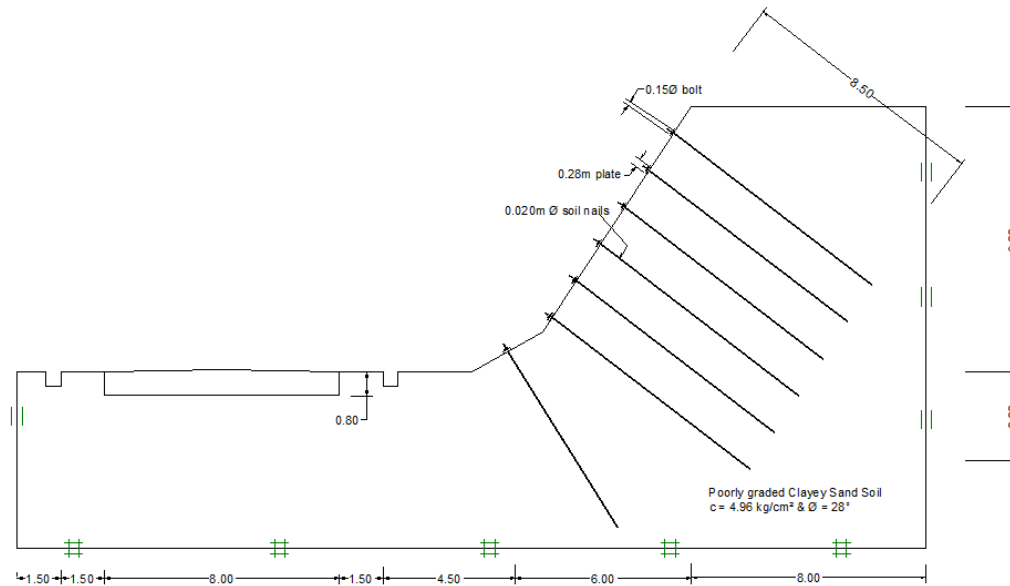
Slope cross-section showing soil nails (dimensions in meters).
